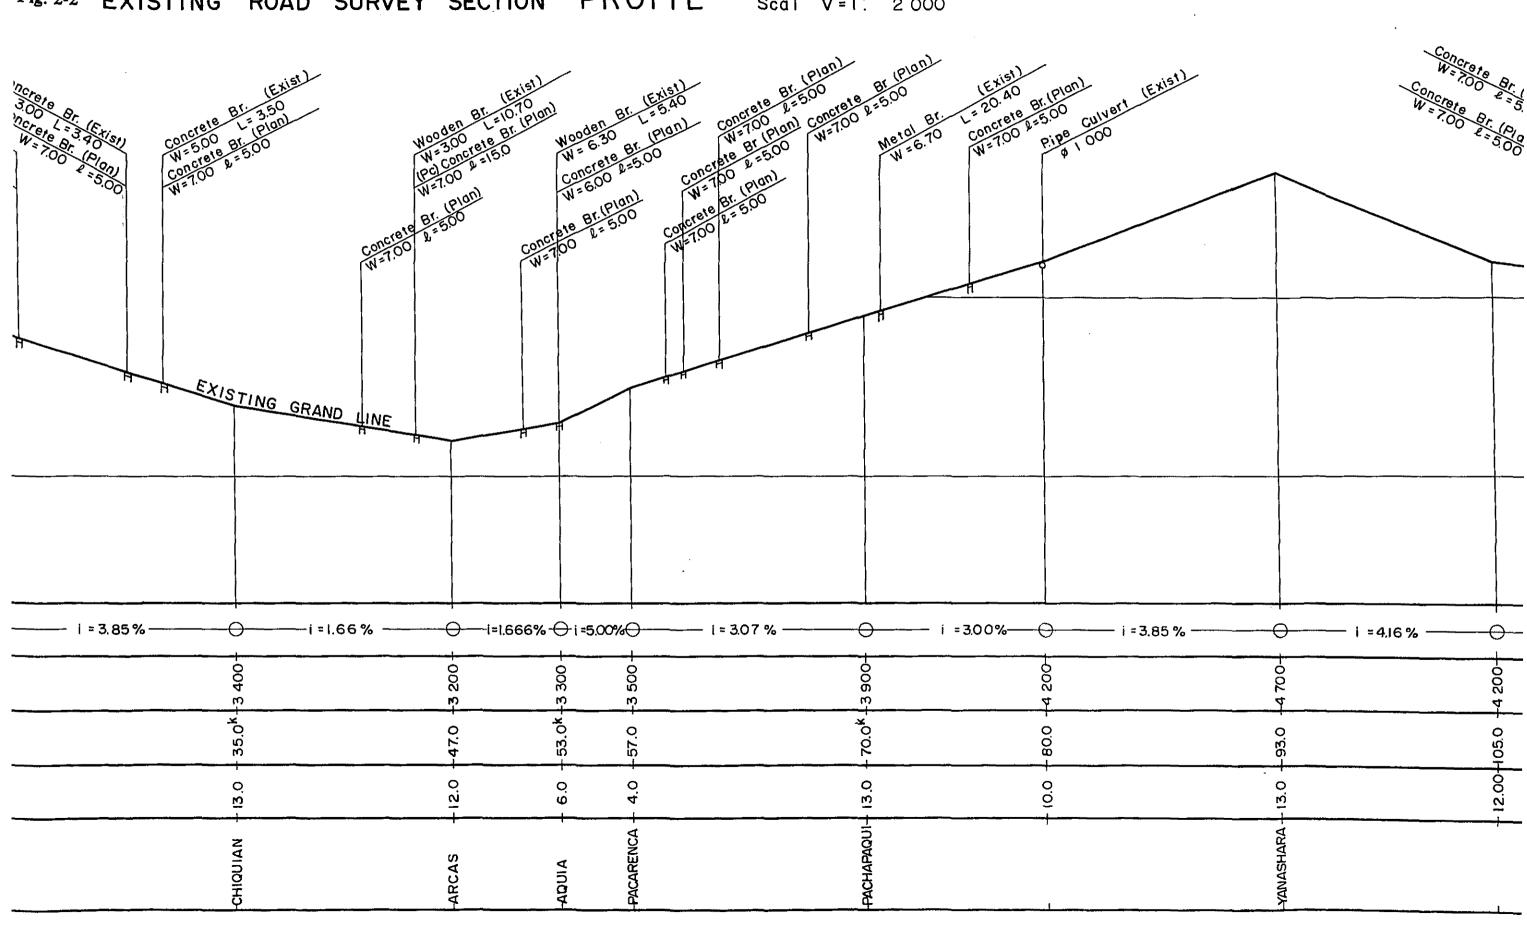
EXISTING ROAD SURVEY SECTION PROFIL Scal V=1: 2000
